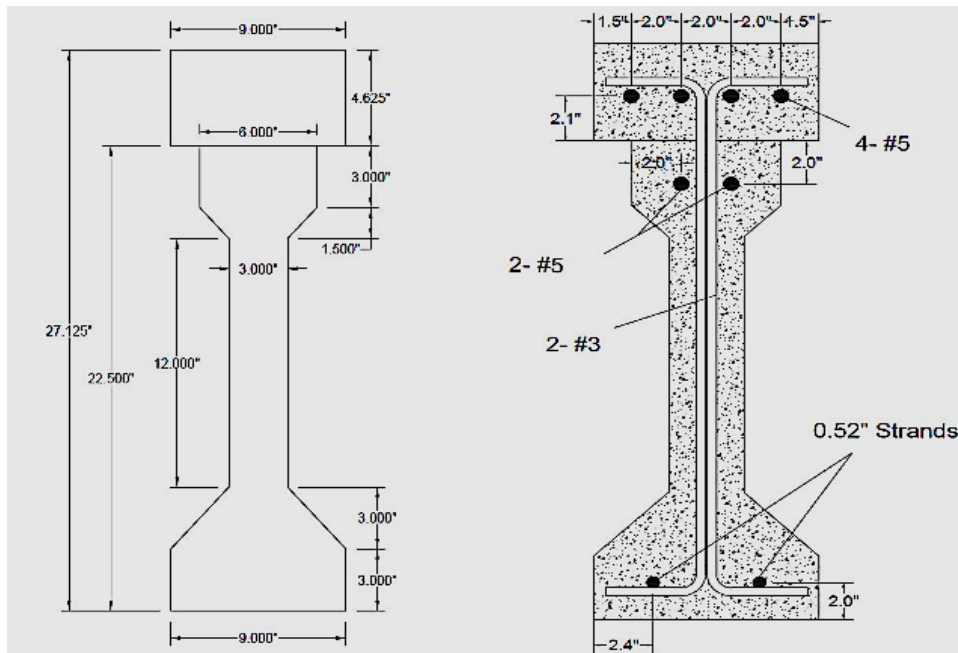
Prestressed girder cross-section (left) and reinforcement details (right) [64]
